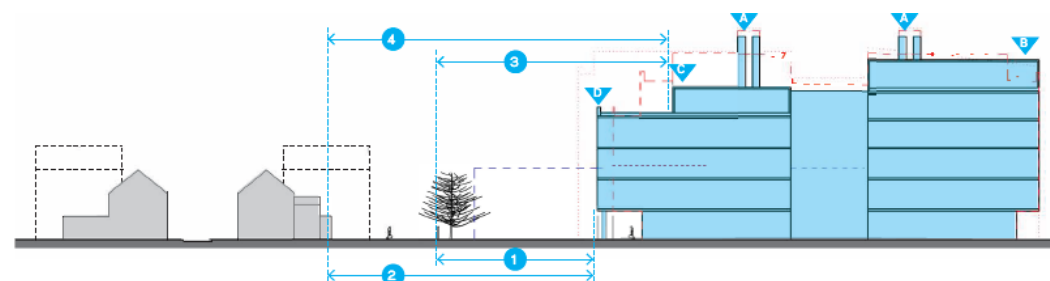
Visualisation and section to show an overview of the Botley Road planning application
